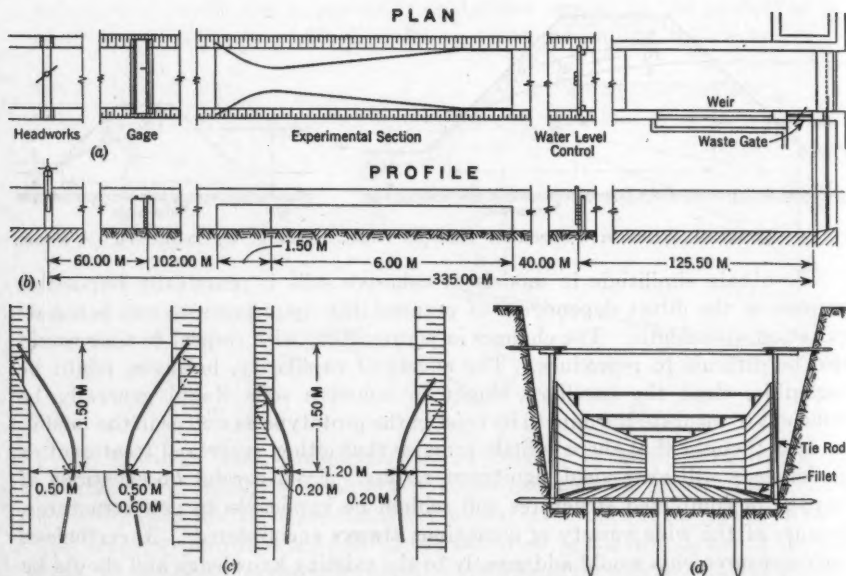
THE EXPERIMENTAL CANAL. (a) PLAN; (b) ELEVATION; (c) DETAILS OF THROAT; (d) VIEW LOOKING UP STREAM INTO THROAT
